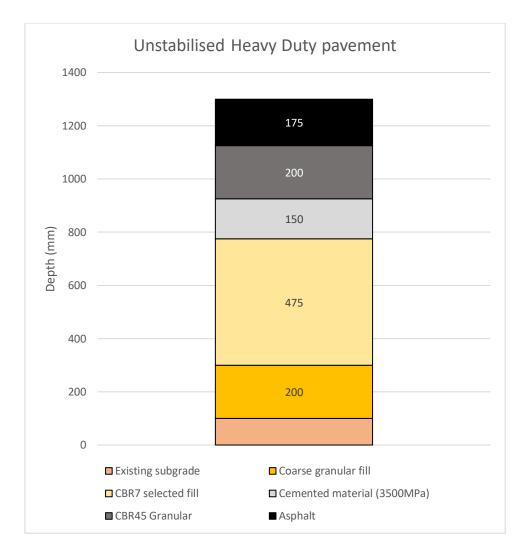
Unstabilised heavy duty pavement (Author 2019)
